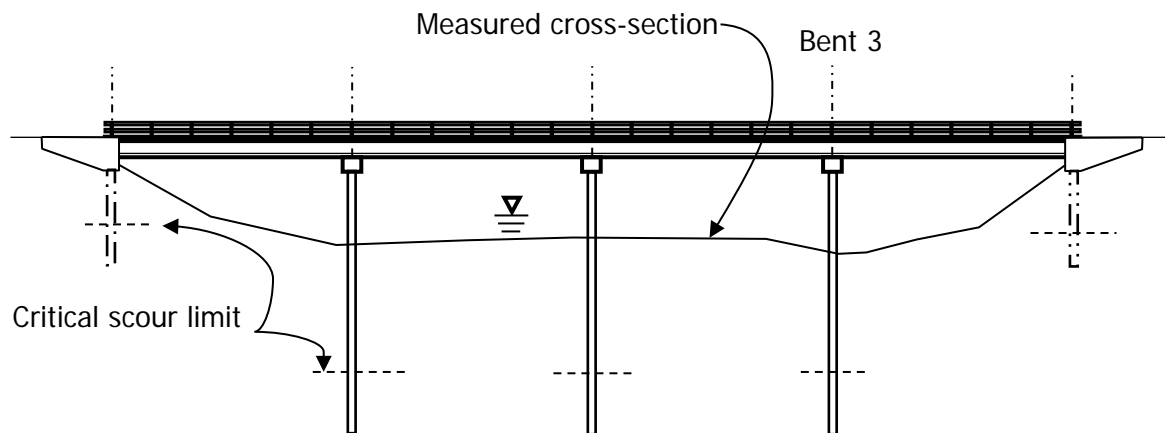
Elevation view showing scour elevations and stream cross-section for a bridge.
